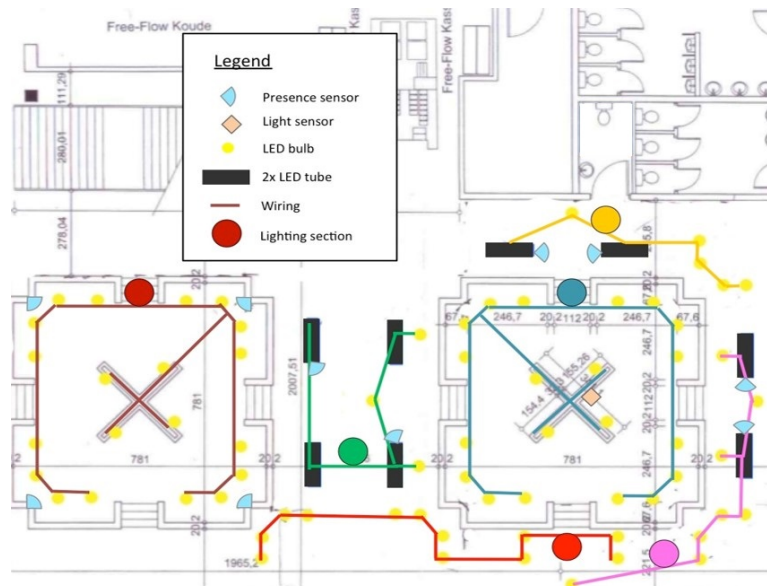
Floor plan of the lighting zones, sensors and lamps in the Vrije Universiteit Brussel restaurant EDISON pilot.
